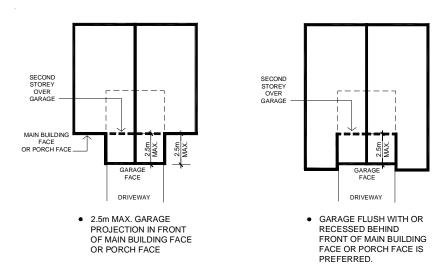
Garage projection criteria for semi-detached and townhouse dwellings
